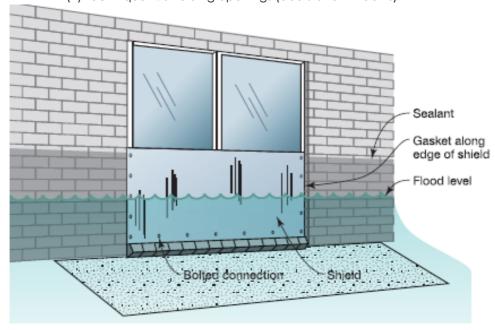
Techniques for dry floodproofing (FEMA, 2000)
